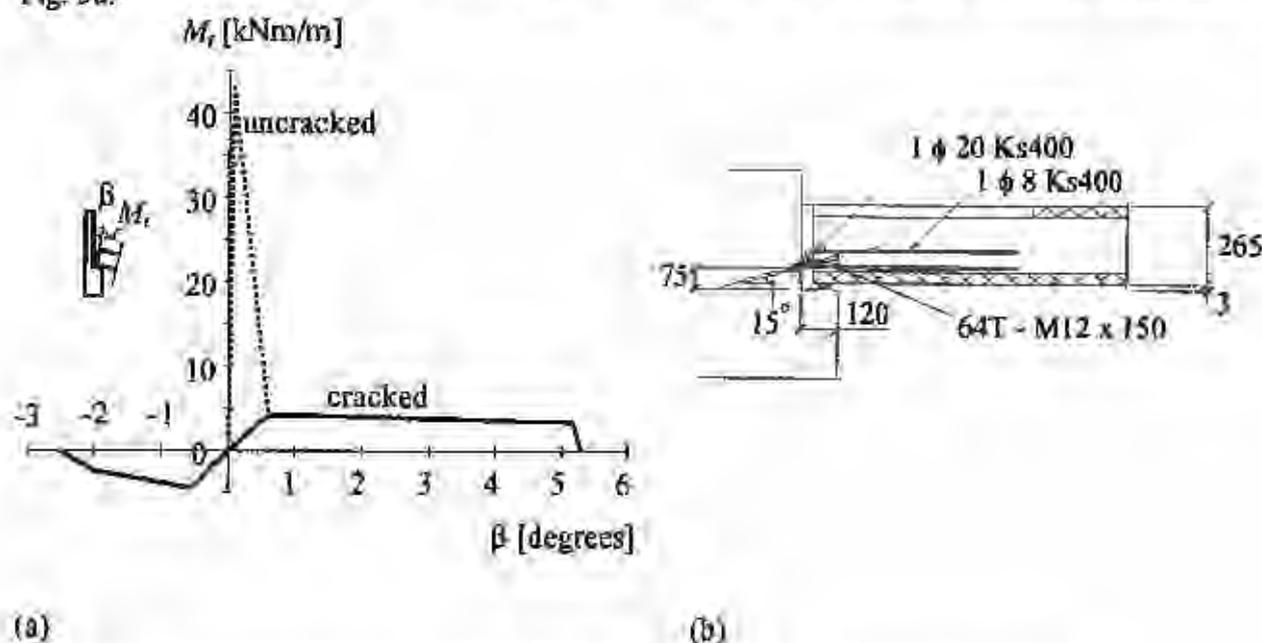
(a) Assumed behaviour of the beam-floor connection of ordinary type;
